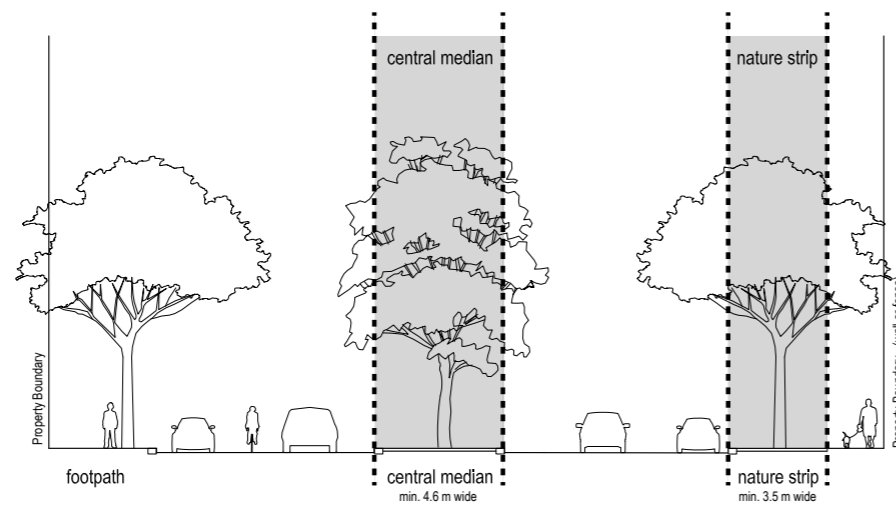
Street garden locations and minimum widths required to accommodate street gardens
